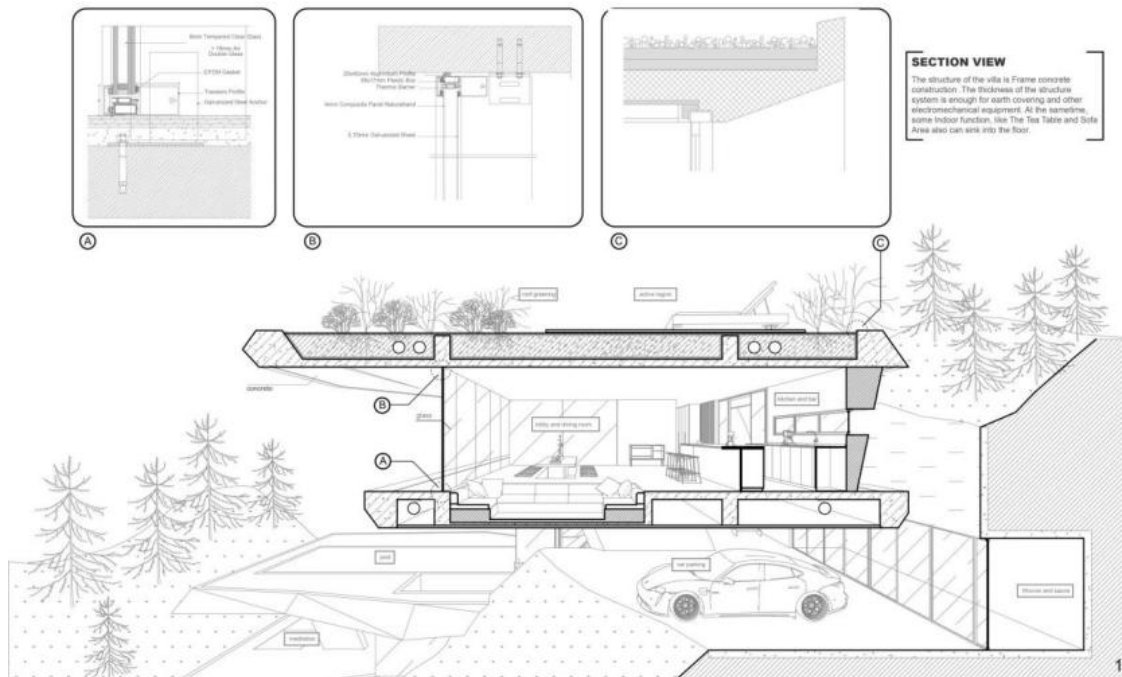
The thickened floor collects all kinds of mechanical and electrical equipment and green soil
